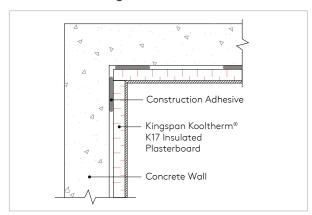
Internal corner detail with Kingspan Kooltherm® K17 Insulated Plasterboard.
